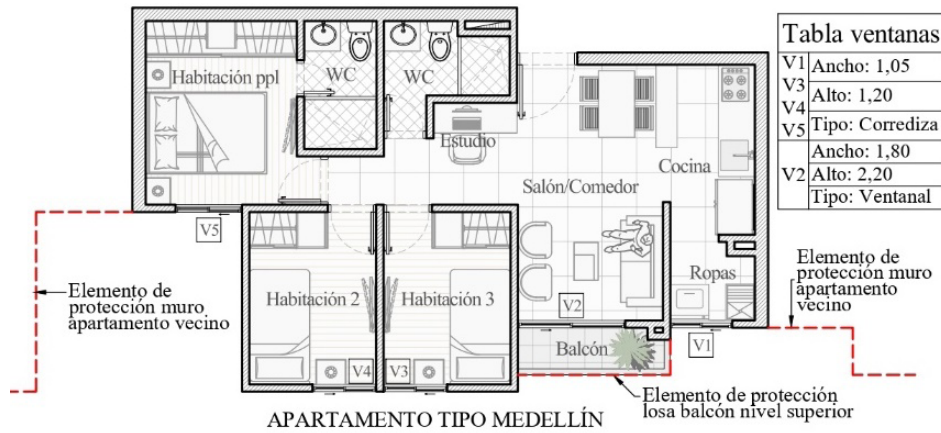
Architectural floorplans of standard housing for Medellín, indicating the location of openings and obstructions. Source: Preparation by the authors.
